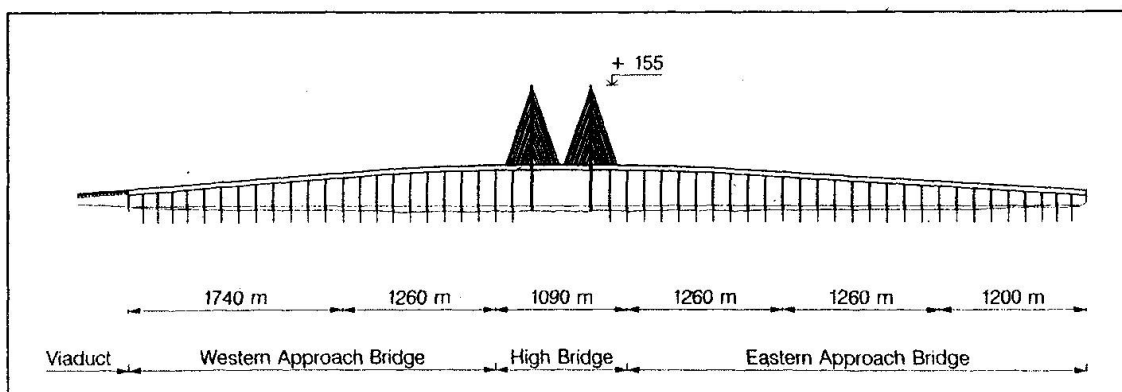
Longitudinal section of the Øresund Bridge (exaggerated vertical scale)
